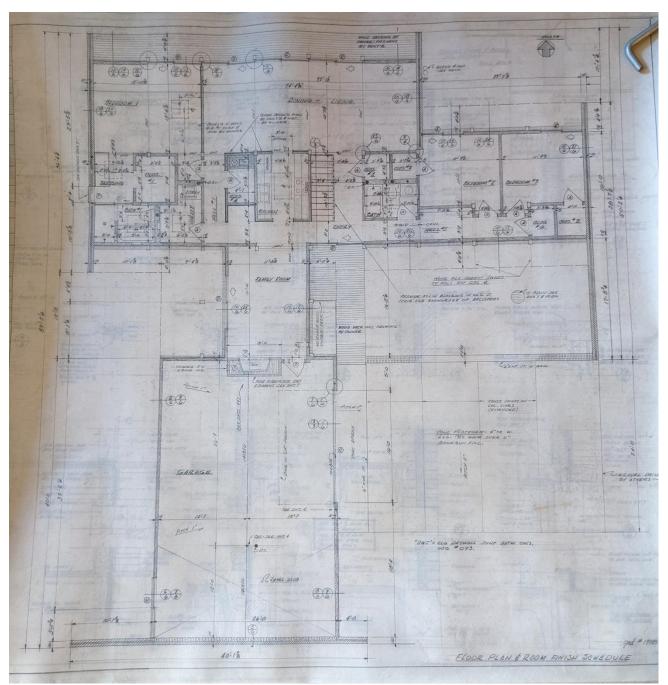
Schmidtke and Layer Architects, Mr. & Mrs. Schmidtke Jr. House, Floor Plan, May 10, 1967.
